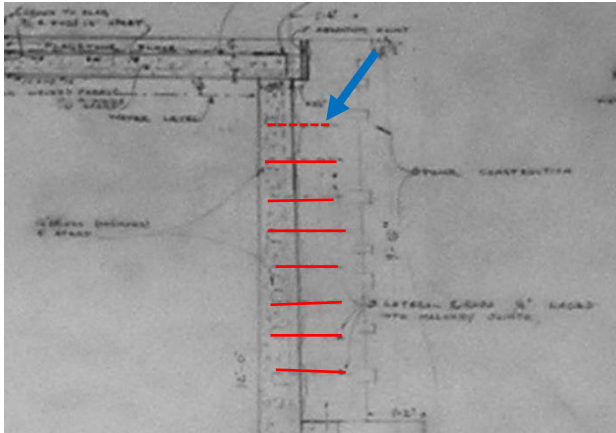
Section from original construction drawings of the water reservoir showing lateral ties (red lines and blue arrow) cast into the concrete that extend into joints at the stone cladding. (Source: Caldwell Archives at the Dubuque Museum of Art)
